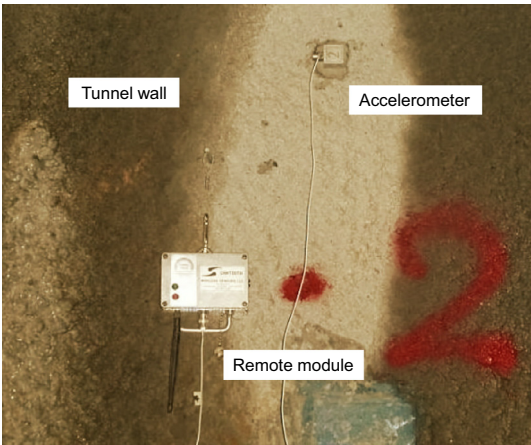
Wireless remote module connected to accelerometer mounted tunnel wall.
